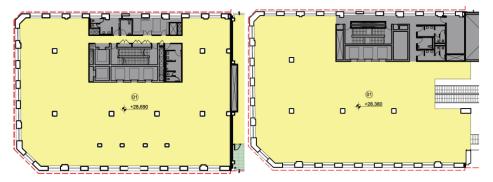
Extract from the plans showing the approved and proposed Leve 2 typical floor plate Source: make Architects
